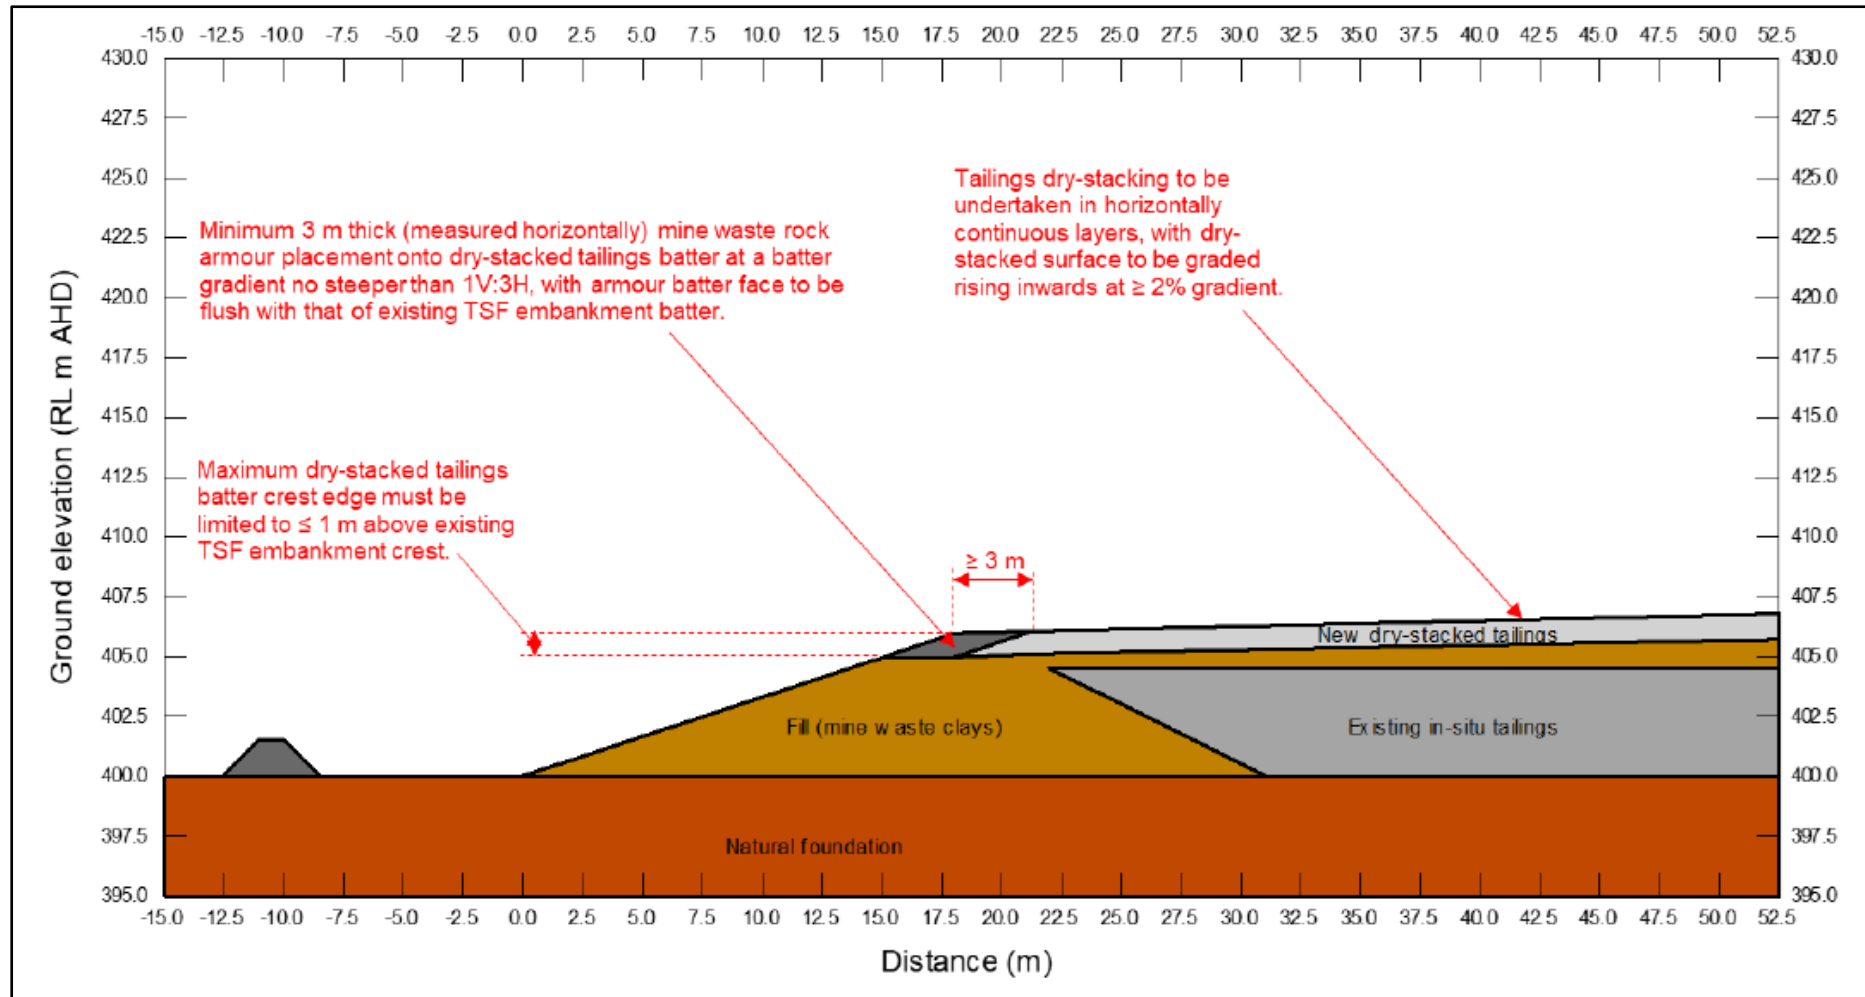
Dry stacking of tailings at the Fingals above ground TSF
